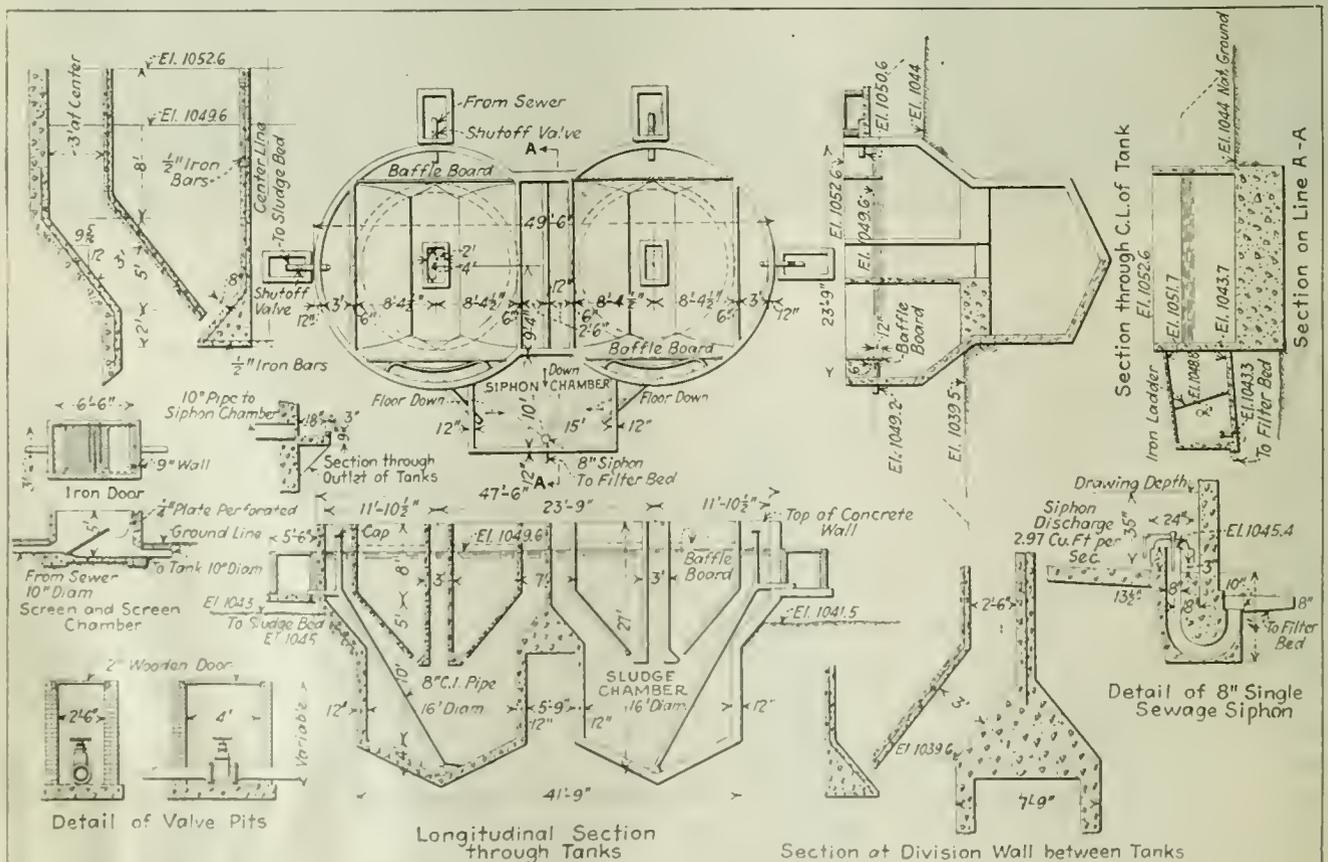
DETAILS OF THE TWIN IMHOFF SETTLING TANKS
